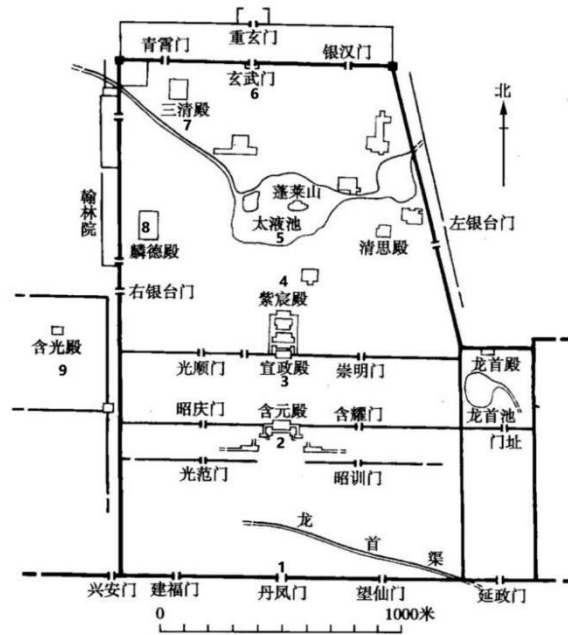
Site plan of Daming Palace (1. Danfeng Gate 2. Hanyuan Hall 3. Xuanzheng Hall 4. Zichen Hall 5. Taiye Pond and Penglai Mountain 6. Xuanwu Gate 7. Sanqing Hall 8. Linde Hall 9. Hanguang Hall).
